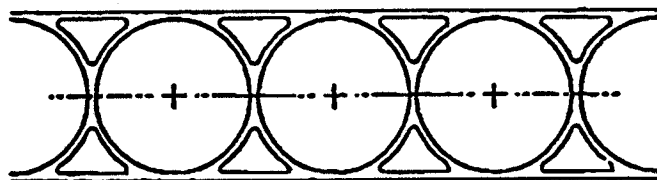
Profile of typical wall cross-section of ADS N-12 HC polyethylene pipe.
